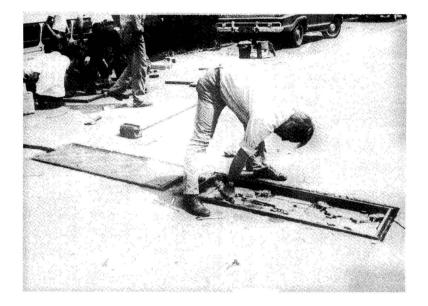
TECHNICIAN ADJUSTING LOAD TRANSDUCER POSITION
